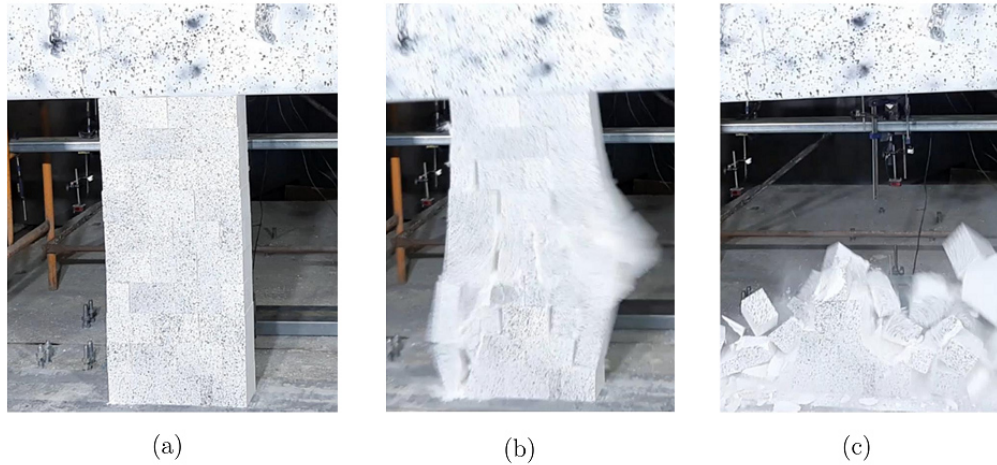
Test specimen S01-01 (a) before testing, (b) during failure and (c) after failure.
